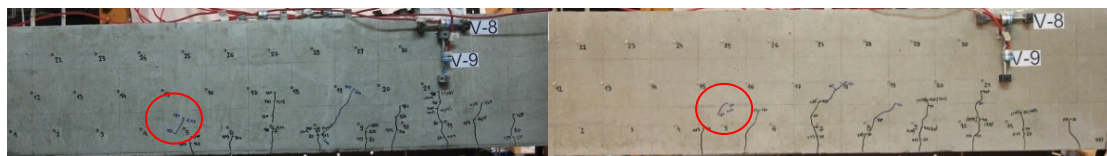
The first shear crack in a) OPC-3 and b) HVFAC-3 beams
